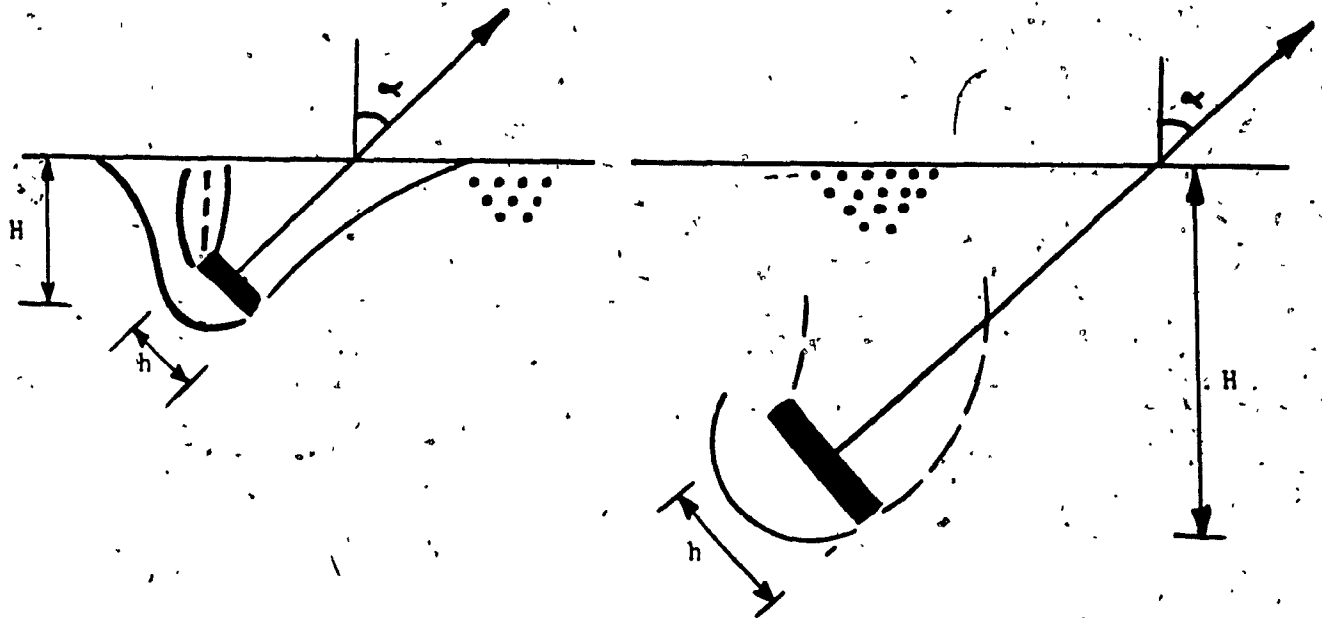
Failure of soil above a strip footing under uplift load (Meyerhof and Adams 1968)
